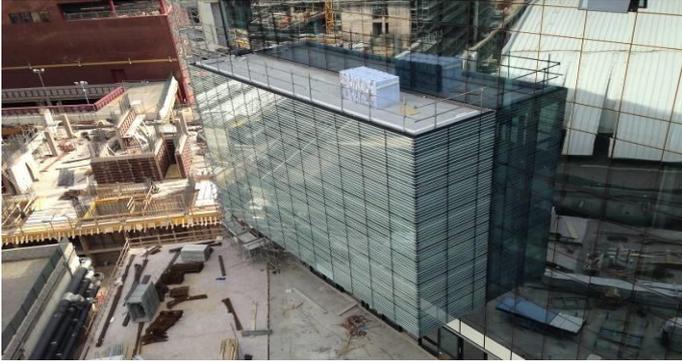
Building ENI 4: cantilever part on 4C /Edificio ENI4 zona a sbalzo area 4C.
